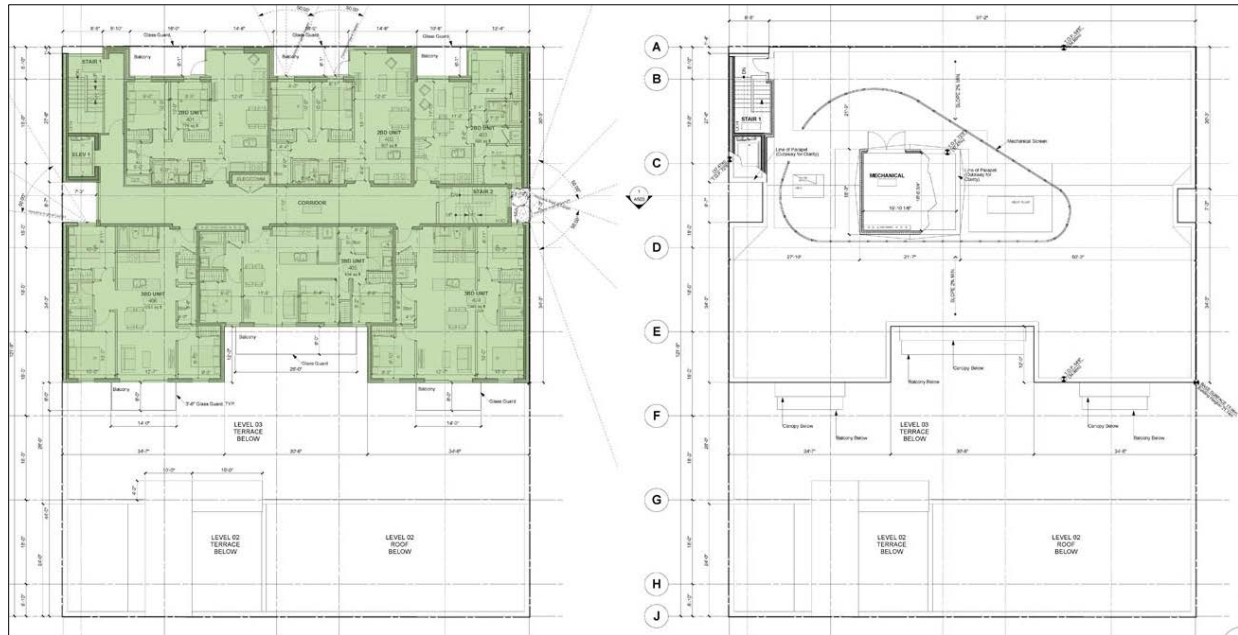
Levels 4 to 6 Floor Plan and Roof Plan
